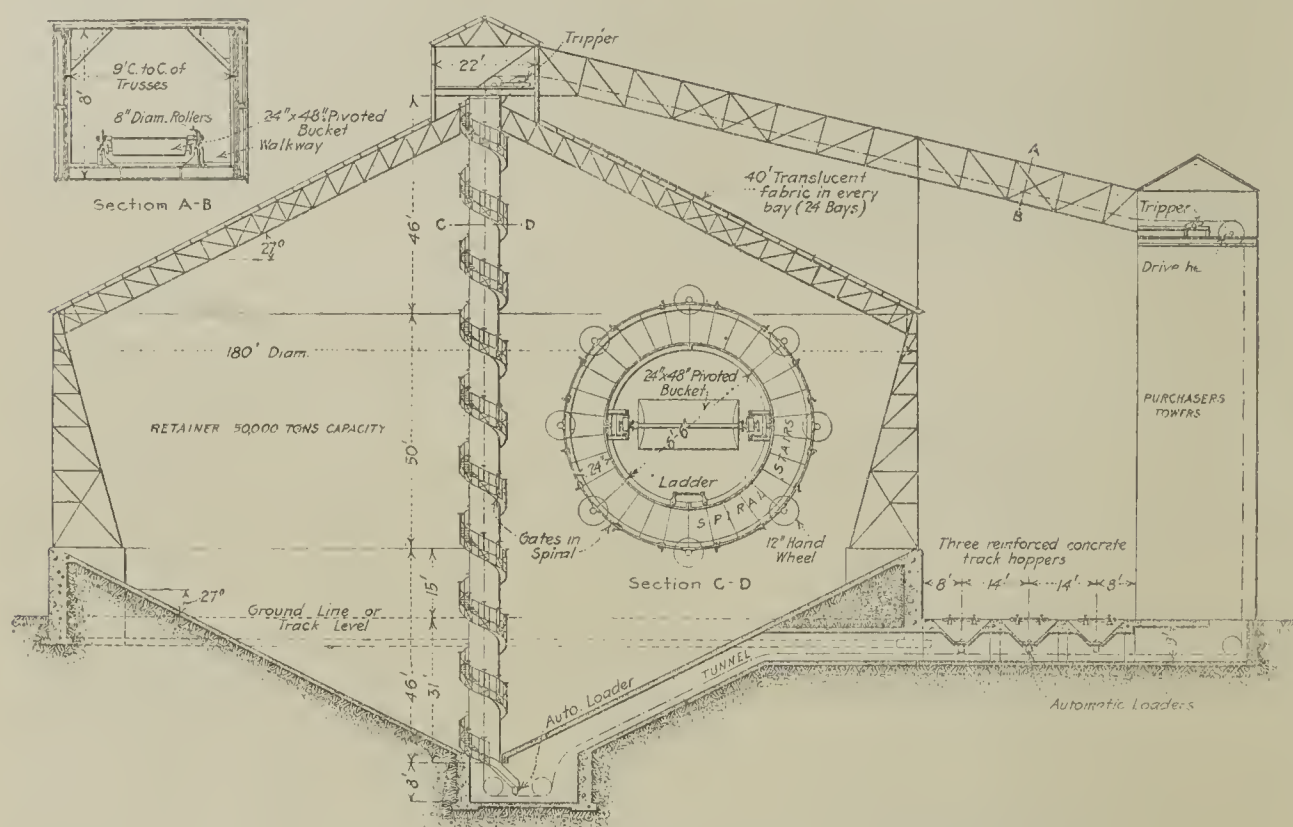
CROSS SECTION OF A SINGLE UNIT SHOWING SOME DETAILS.
